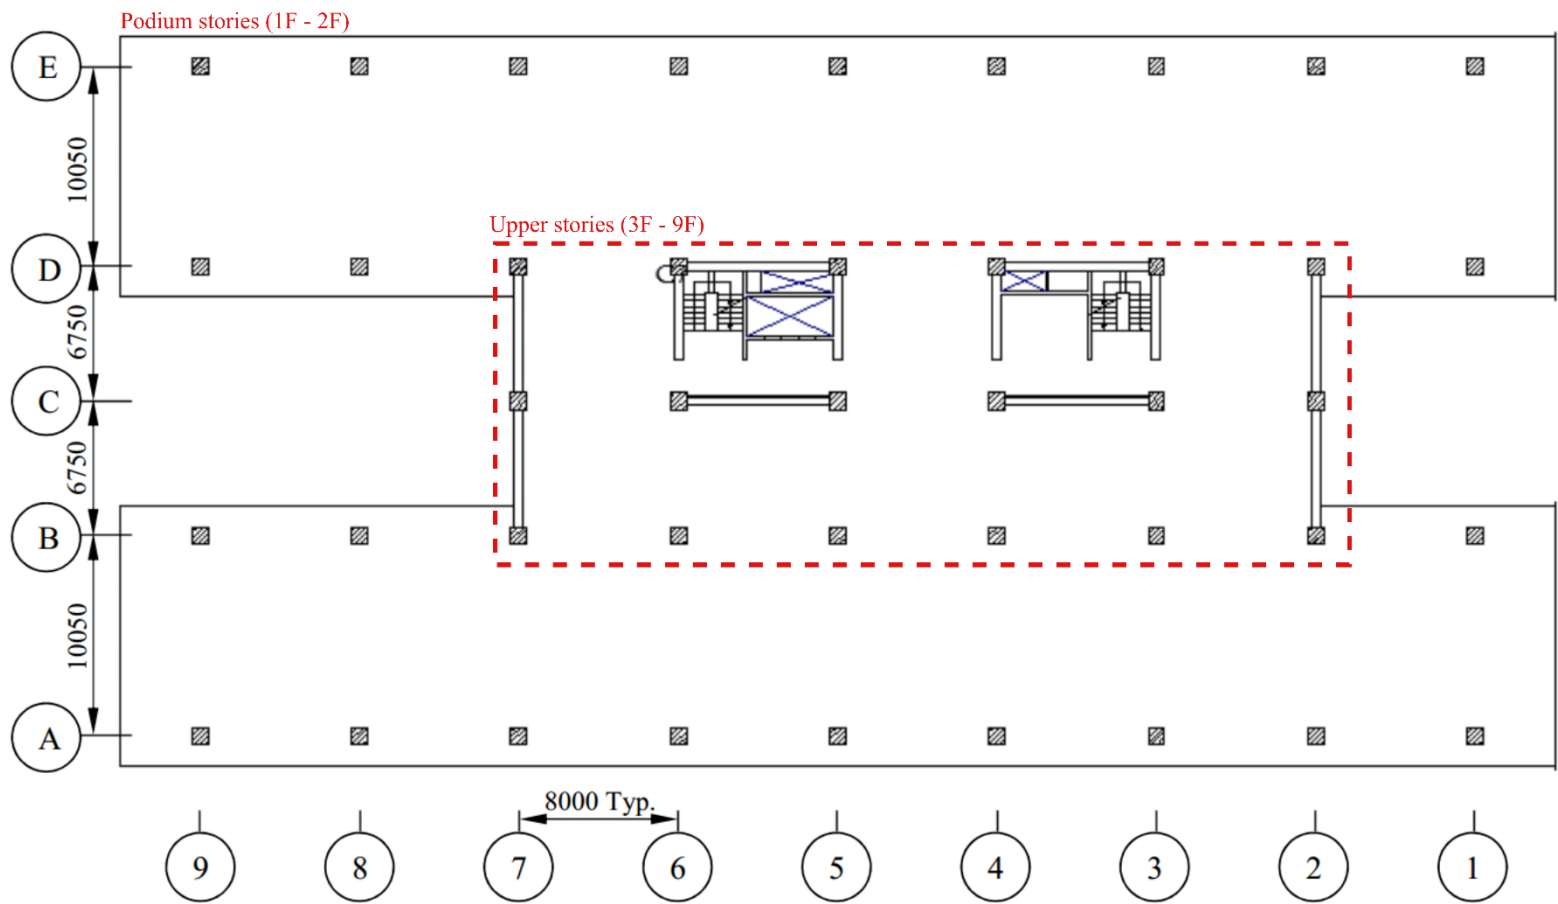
Floor plan of the Building of the Department of Civil Engineering (dimensions in mm) [from Wang et al. (2012), Fig. 2].
